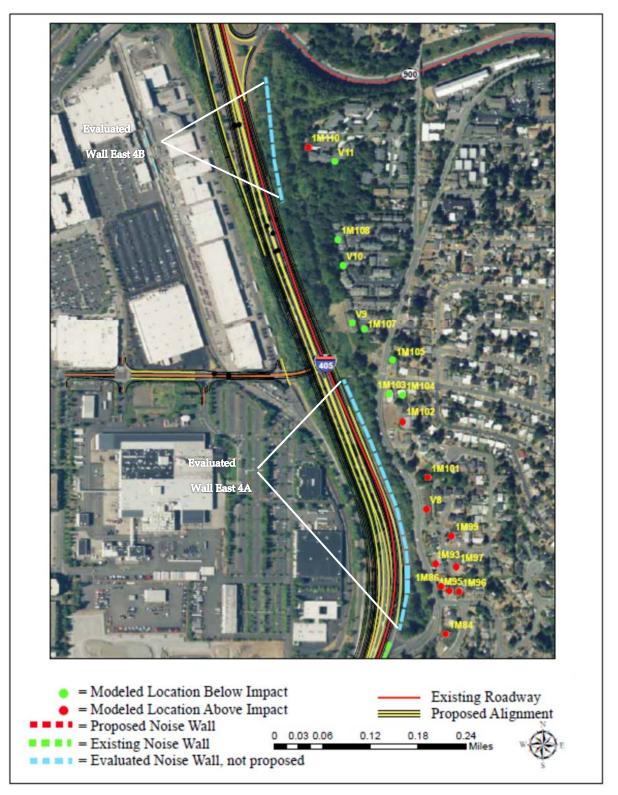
Evaluated Noise Wall Alignments – SR 900 to N 30th Street
